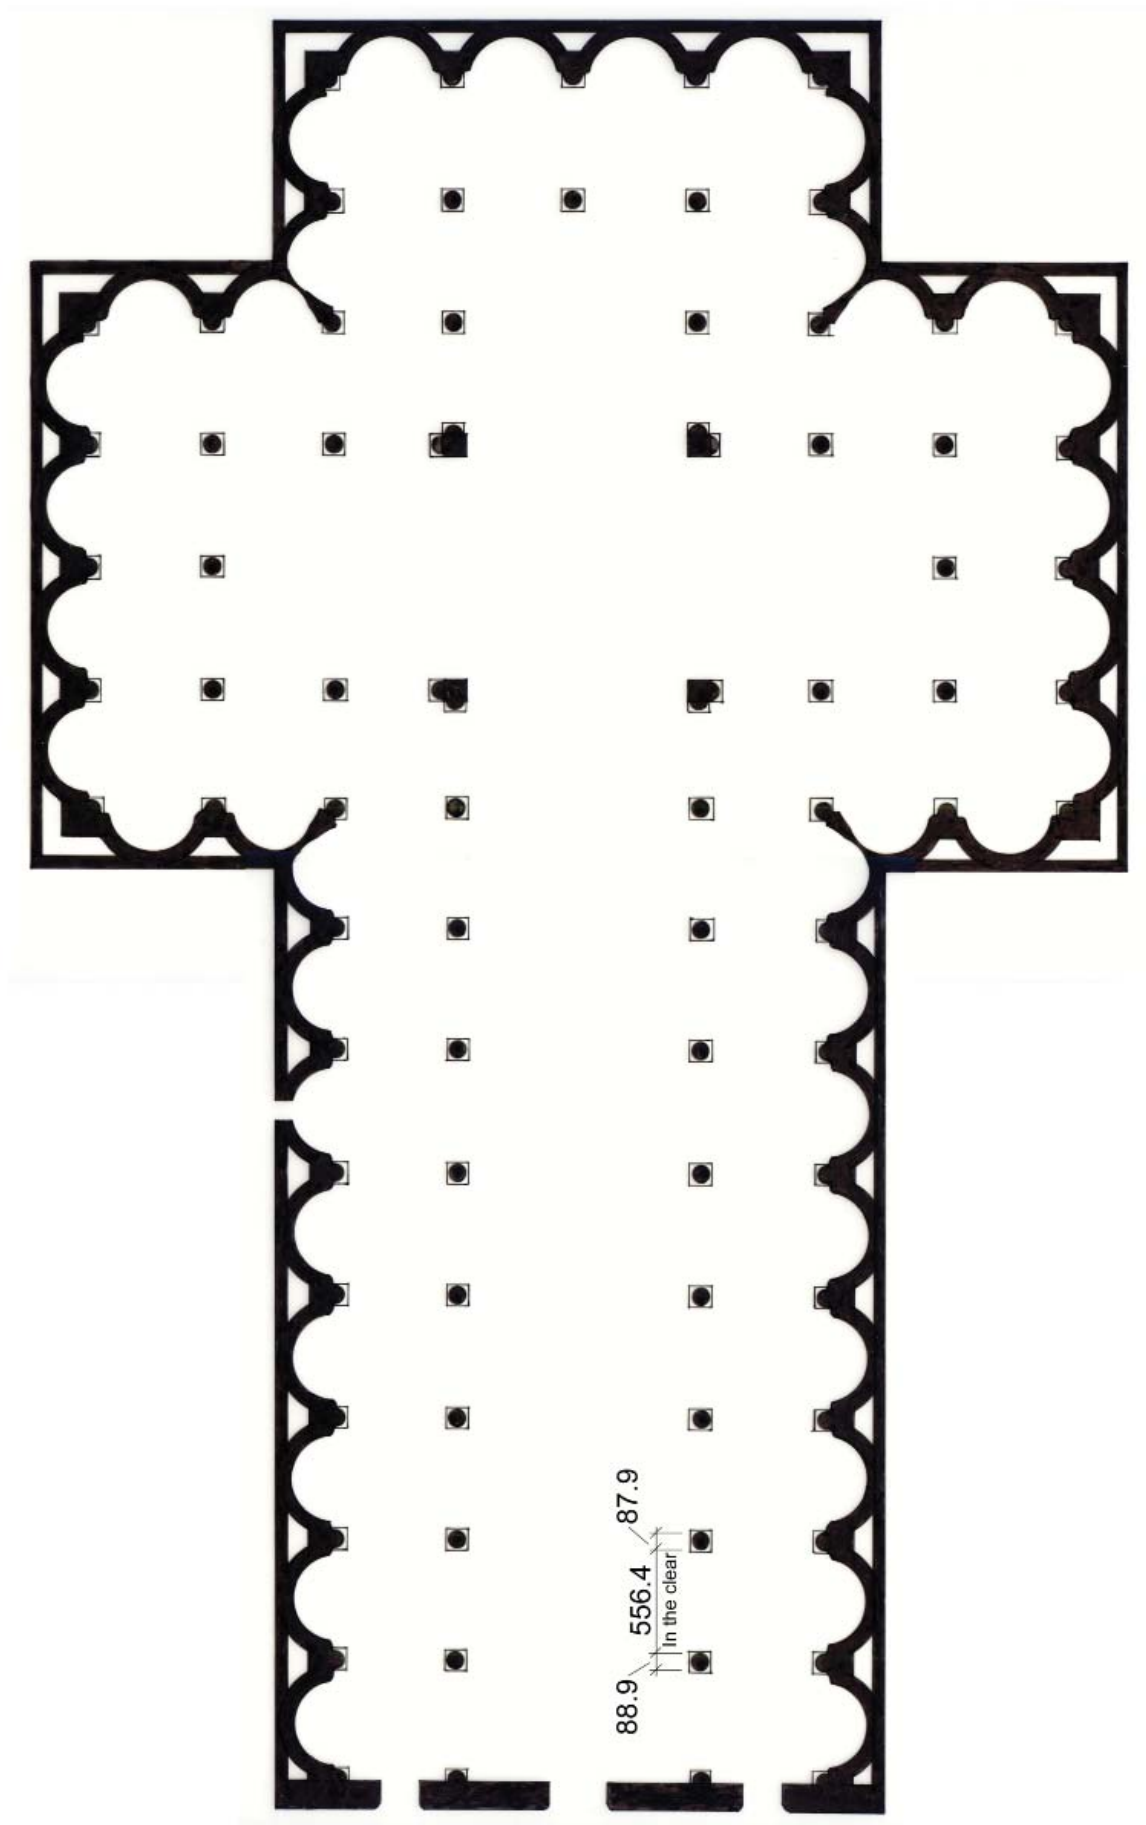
Basilica of Santo Spirito, Florence, floor plan (author).
